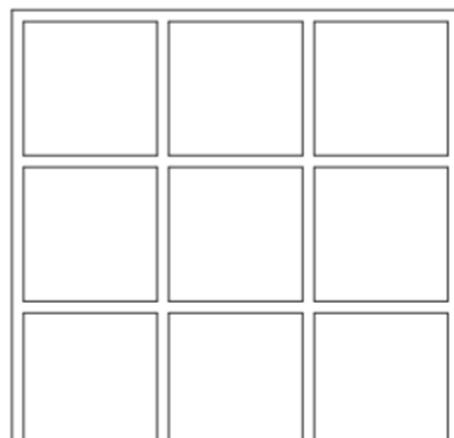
Supporting arrangement of screed within insulation layer in the system with continuous concrete strips (plan view)
